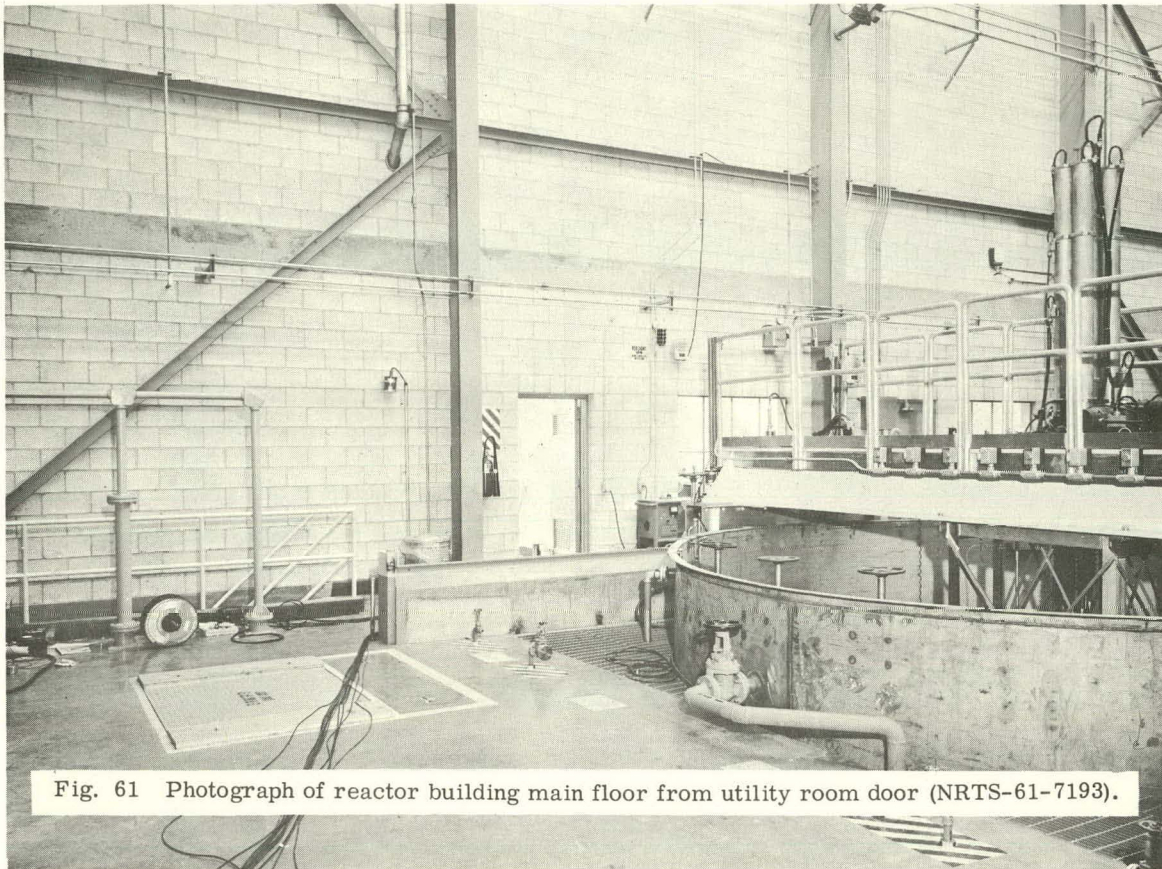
Photograph of reactor building main floor from utility room door (NRTS-61-7193).
